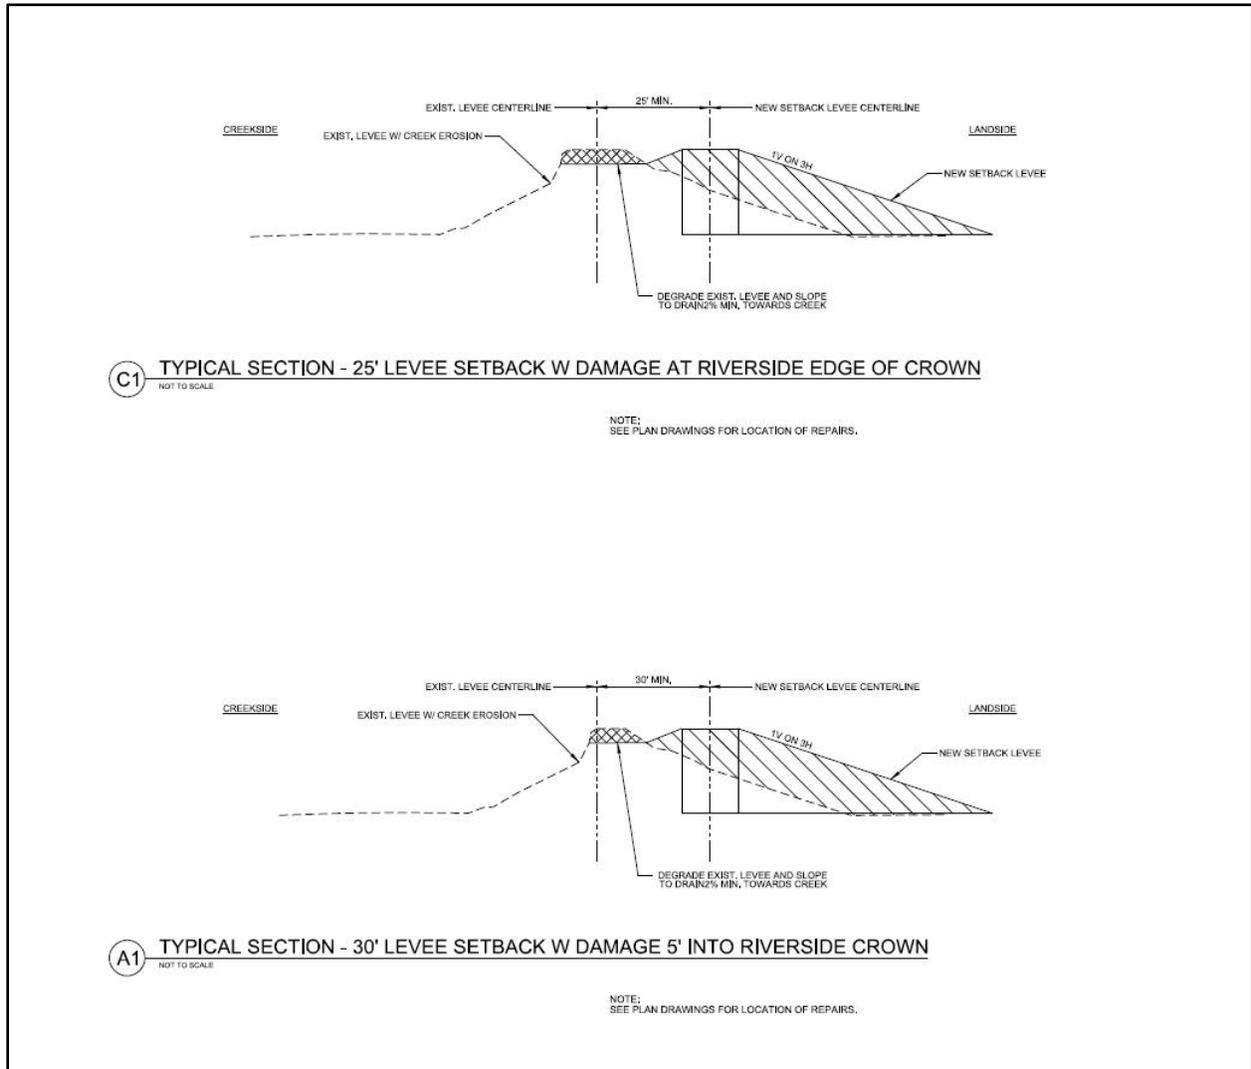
Typical cross section diagram of 25' and 30' levee setback.
